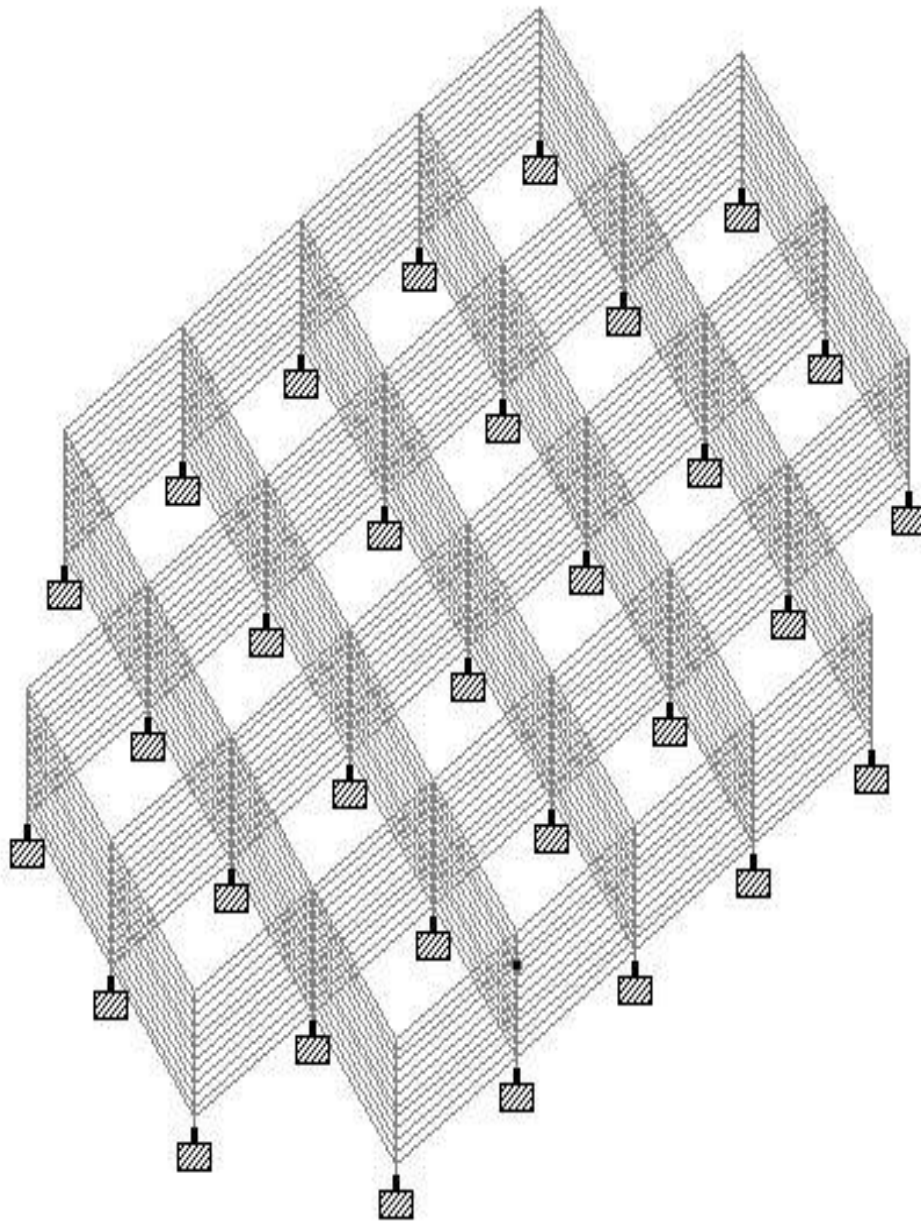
3D view of of + shaped Re-entrant corner Structure(12 Storeys)
